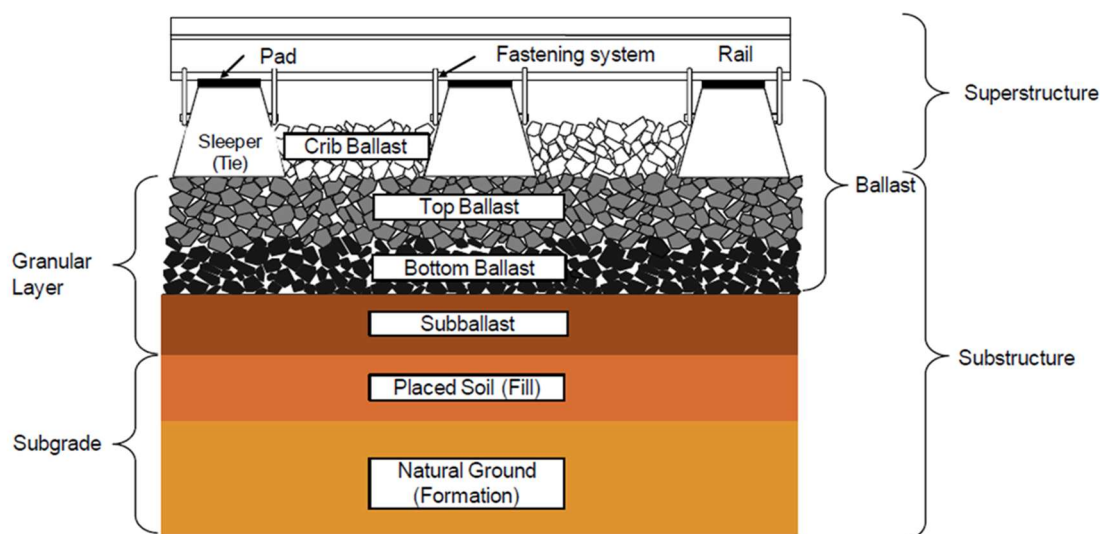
Conventional railway track structure (adapted from Selig and Waters, 1994)
